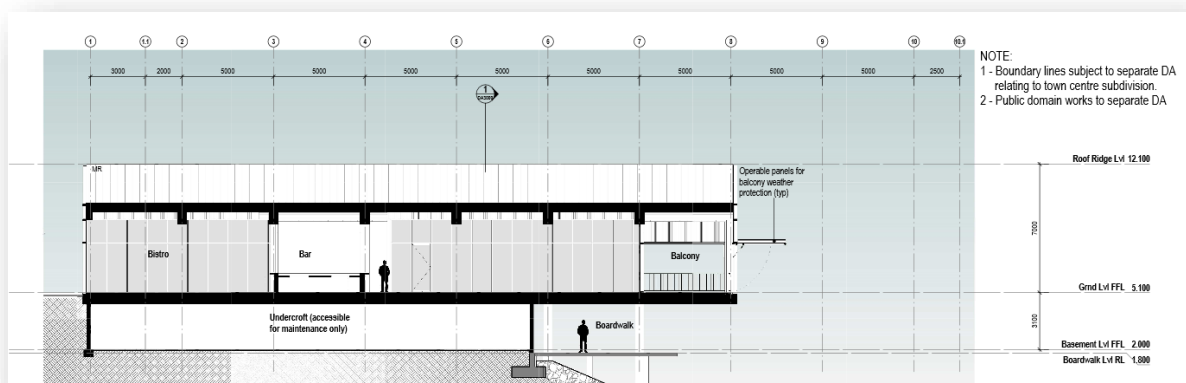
Section Plan of Tavern and undercroft Boardwalk Area
